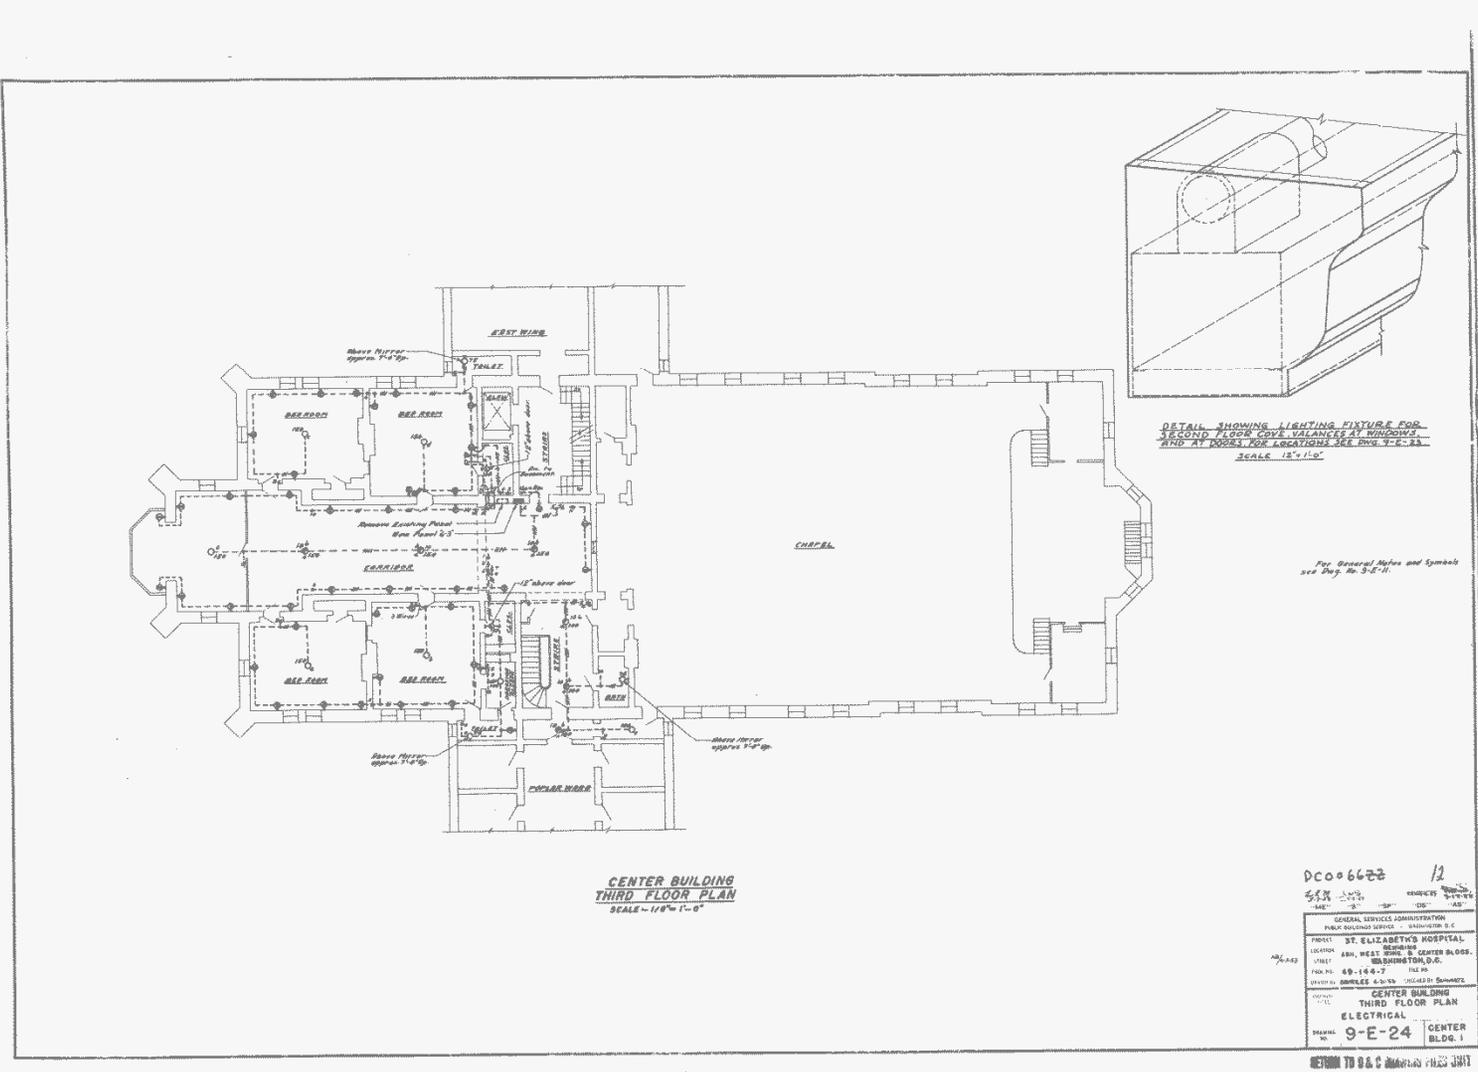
Third floor plan of the Center Building outlining improvements to the electrical system, 1953. Source: GSA archives, image DC0066SE0012.
